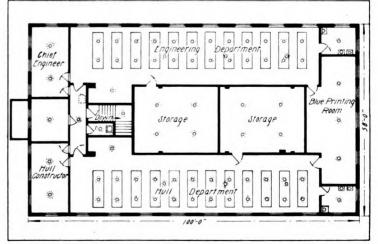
PLAN OF HULL AND ENGINEERING DEPARTMENTS, OFFICE BUILDING
